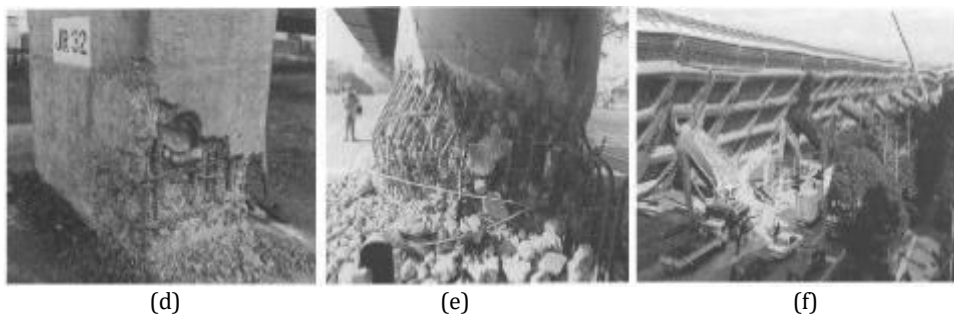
A few damages scenario of a few highway bridges in the recent earthquakes; (d) Bond failure of lap slices of bridge pier in the Loma Prieta earthquake in 1989, (e) Flexural failure of a bridge pier in the 1995 Kobe earthquake, (f) Flexural failure above pier base of piers of the Hanshin Expressway in the 1995 Kobe earthquake
